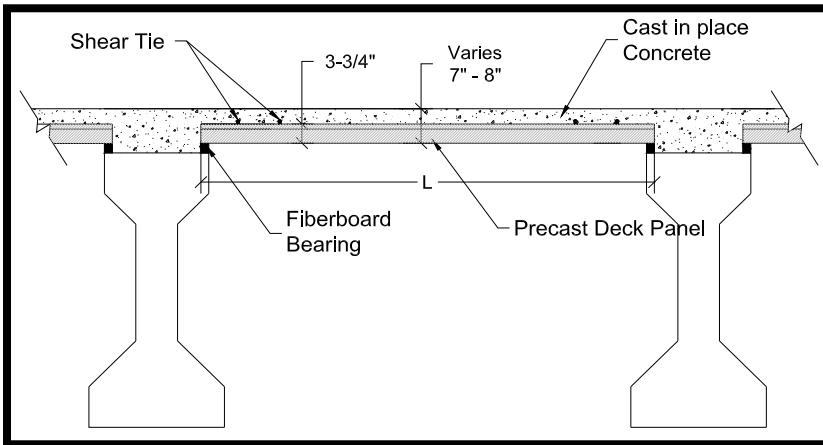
Composite Deck- Precast Deck Panel and CIP Concrete
